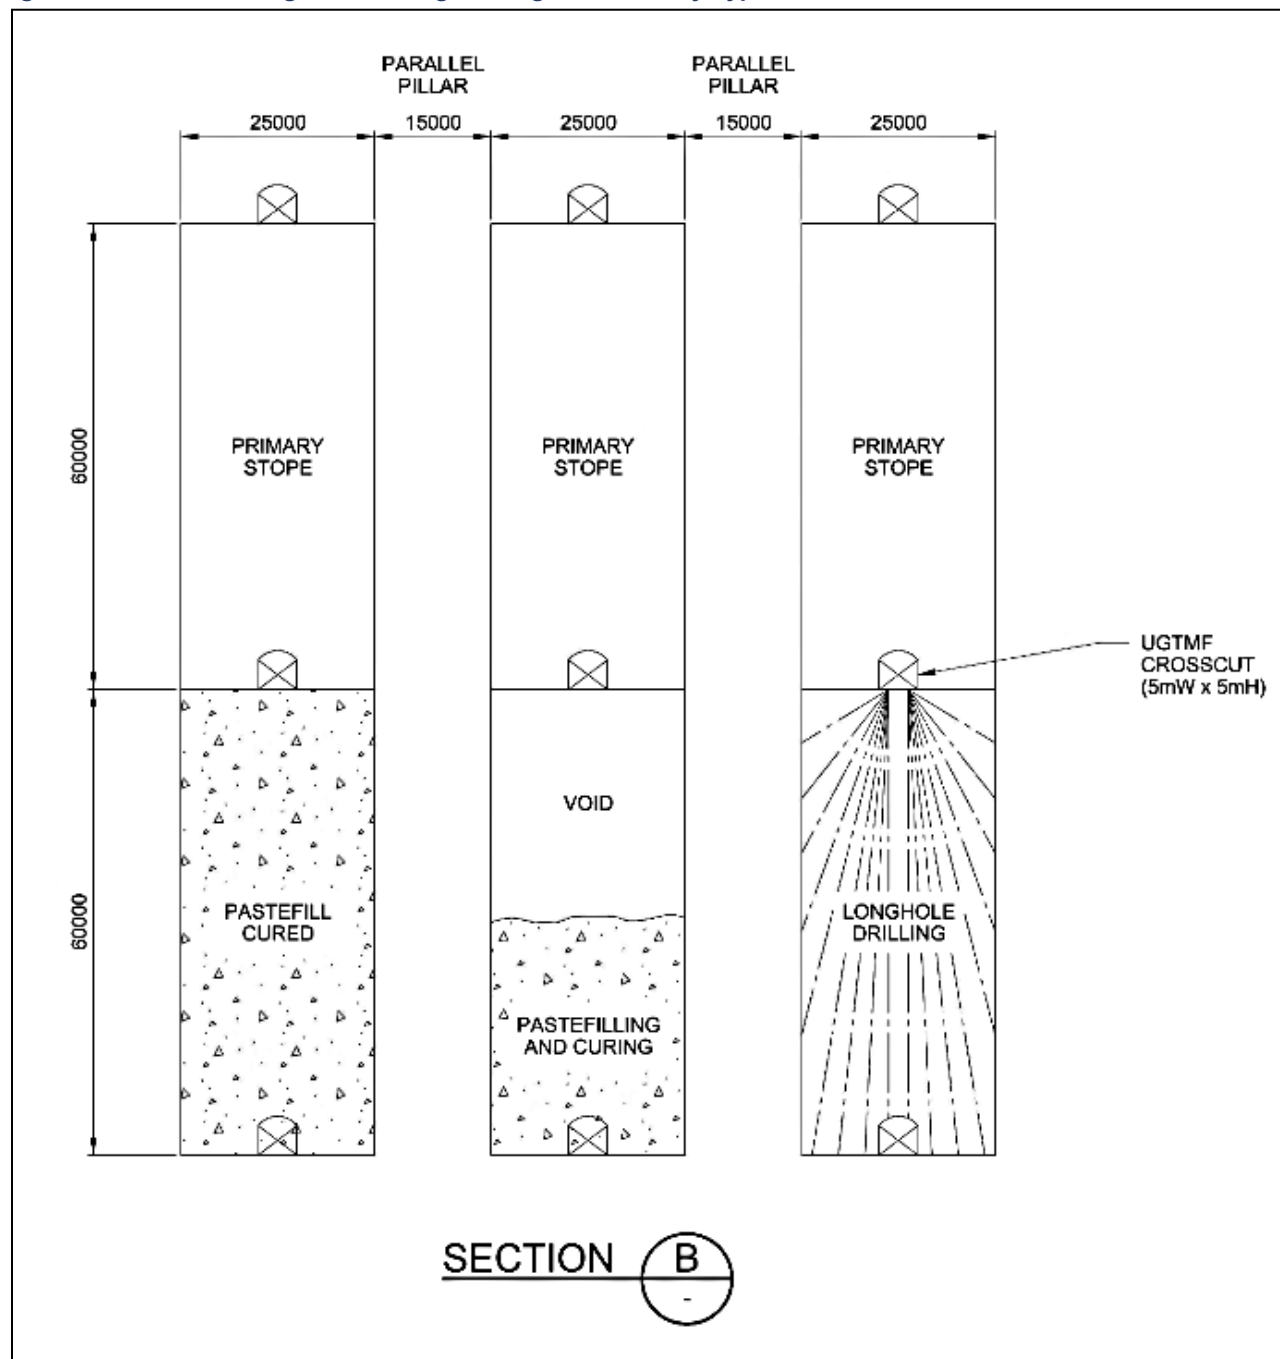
Underground Tailings Management Facility Typical Section B View
